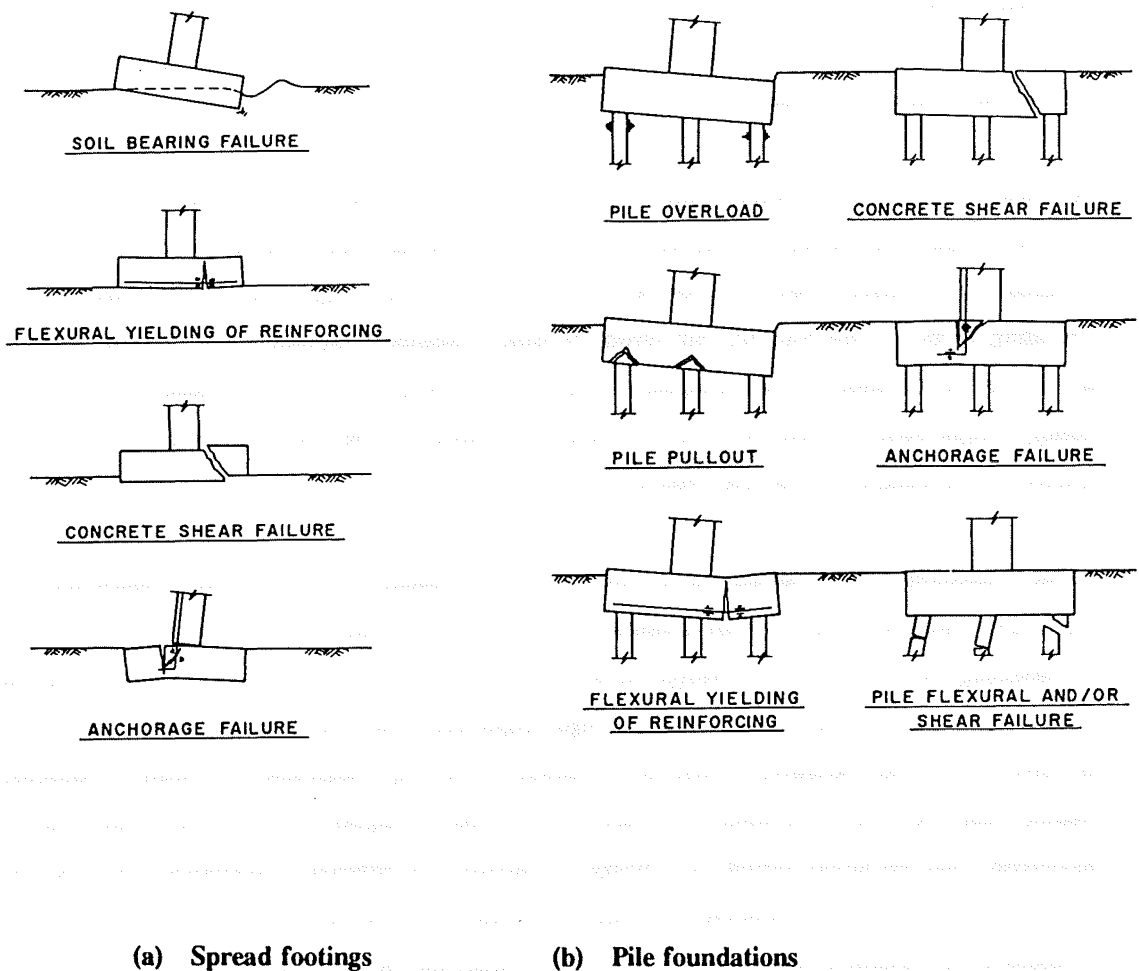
Possible failure modes for bridge foundations [ATC 1983].
